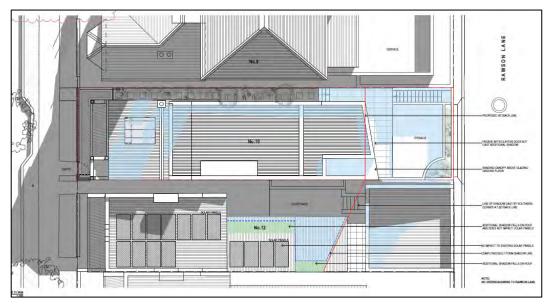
Overshadowing impacts at 9AM to roof of dwelling and garage at 12 Rawson Avenue.
